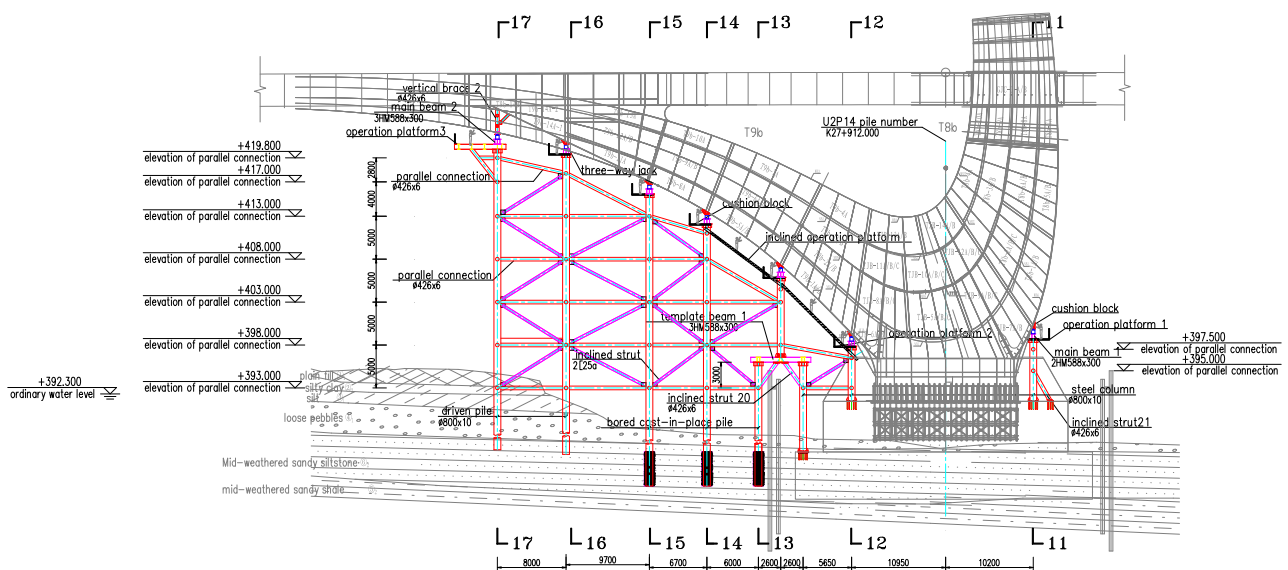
The elevation layout of the assembling support of the V-shaped lower tower columns on the downstream side
